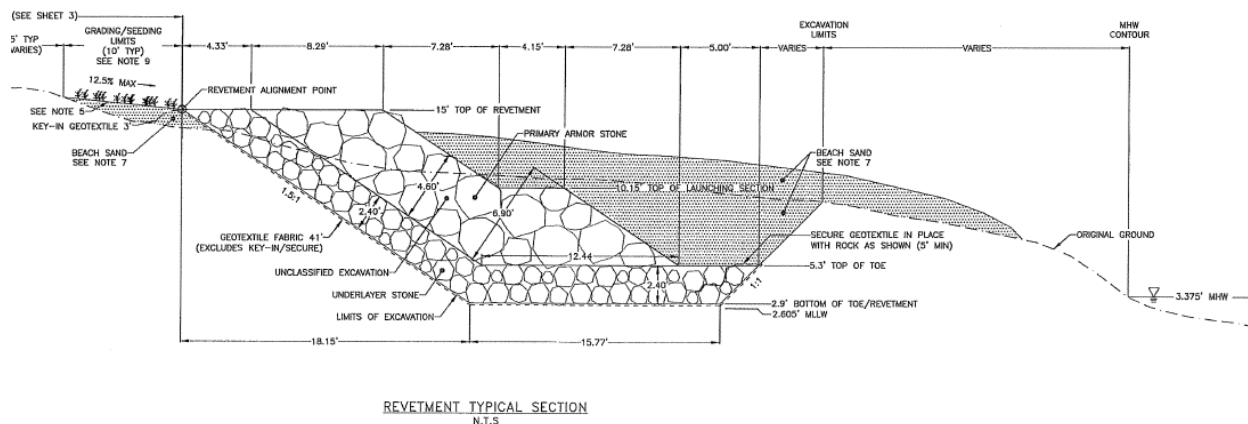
Kivalina airstrip revetment “as-built” cross section (DOT&PF, 2018)
